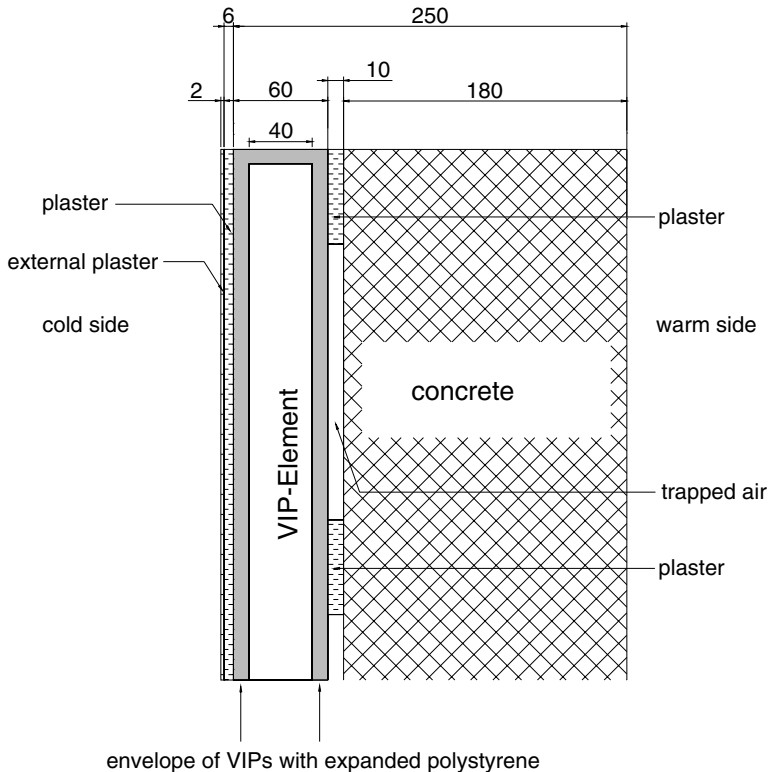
Cross-section detail of the investigated wall (dimensions in mm).
